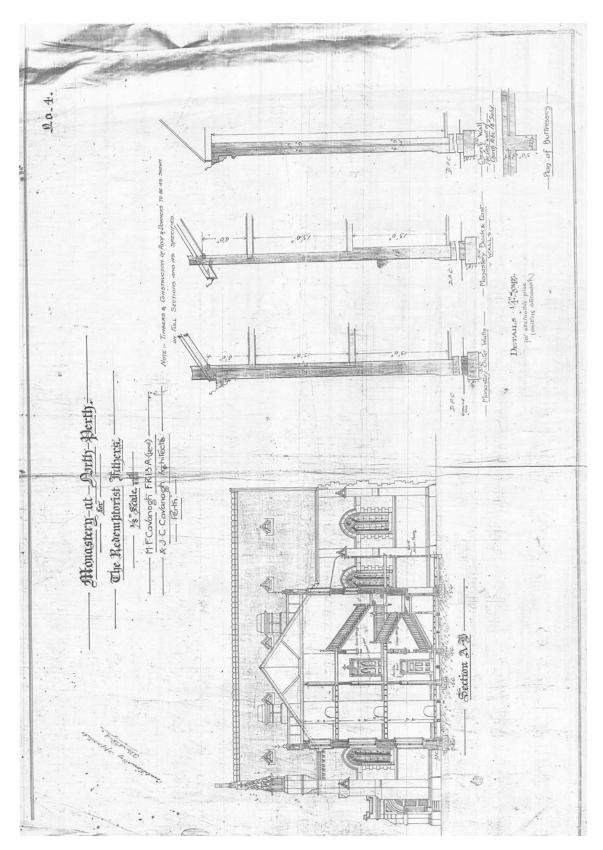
'Monastery at North Perth for the Redemptorist Fathers', Section A-B and Details, No.4, c.1903. Note the gablets and dragon back ridge tiles to the church. Plan courtesy of the Redemptorist Fathers.
